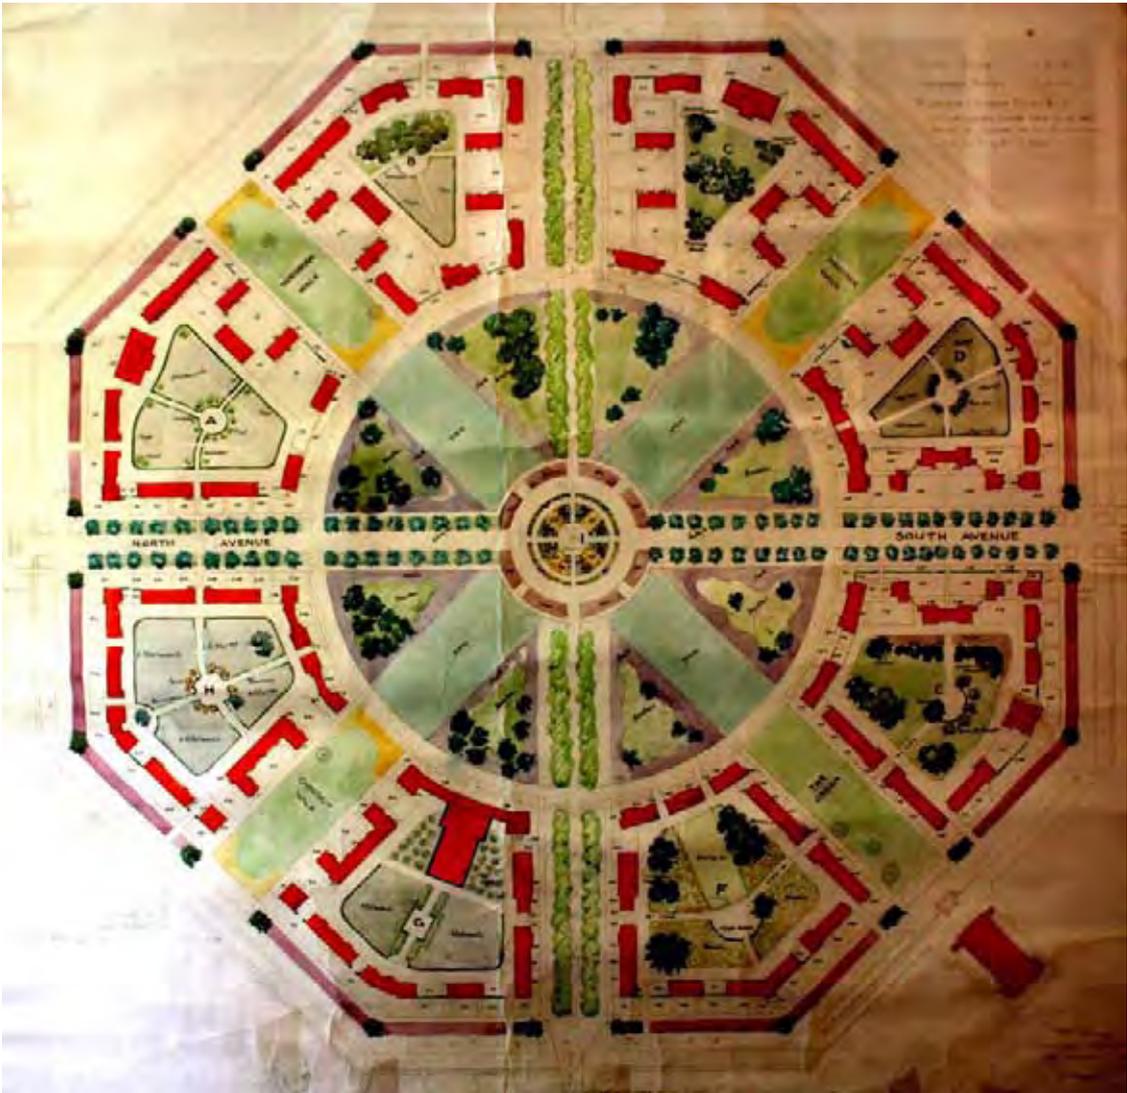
An extract from an early landscape plan for the central octagon area, provides no detail in relation to front gardens
